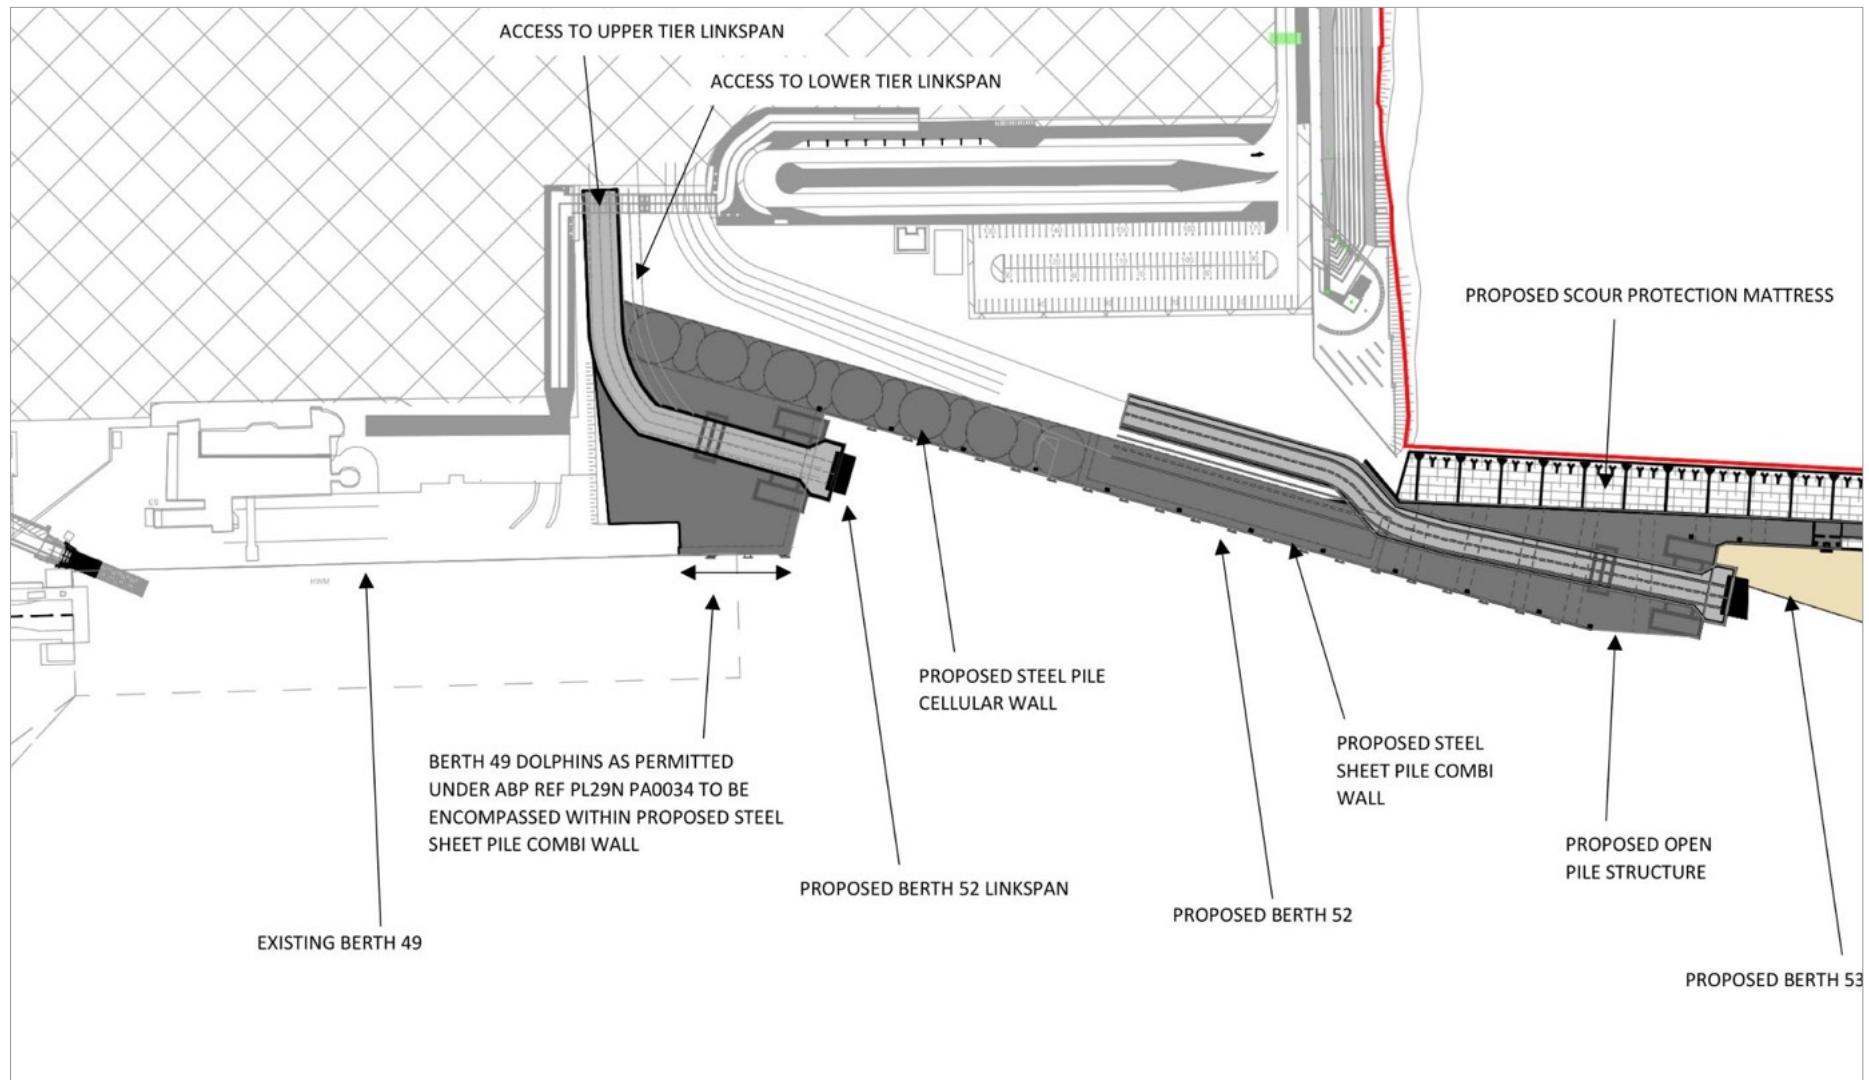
Plan View of Amendments to Proposed Berth 52 and Berth 49
